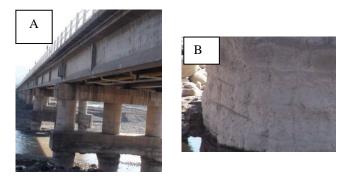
a) Totkabon Concrete Bridge b) Totkabon middle pier water scour.
